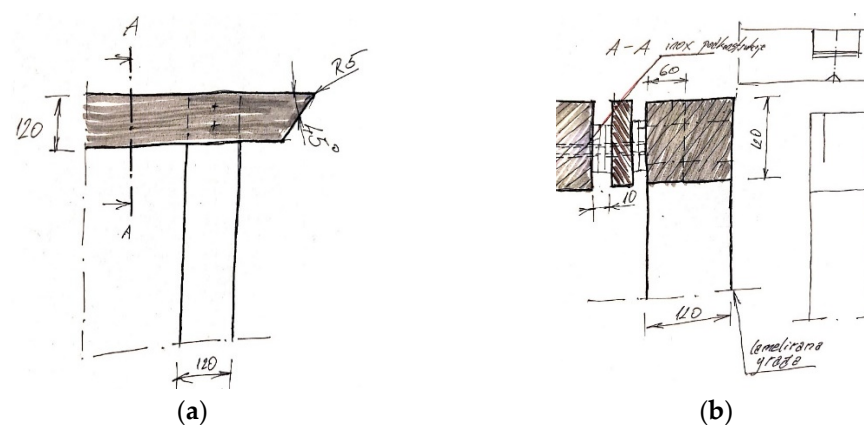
Sketches of the angular-lateral joint: (a) view; (b) cross-section; the proposal is of construction and the joining of vertical with horizontal laminated beams, which, when thus joined, form the ceiling frame.
